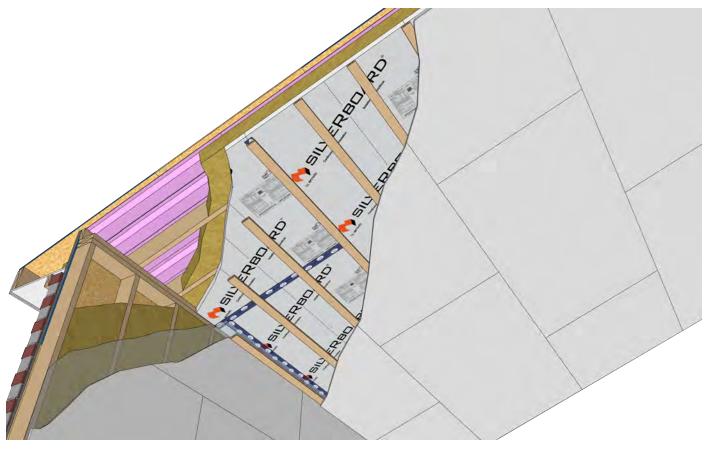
2" (51mm) high density SilveRboard installed with furring strips to underside of wood rafters
